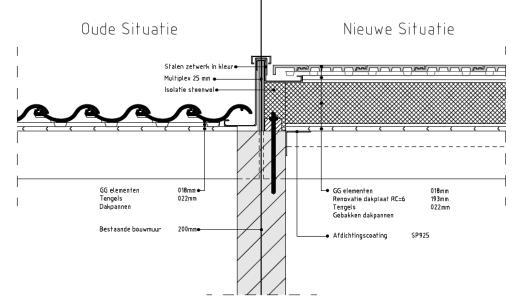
Roof renovation (source: Jansen Huybregts Projecten BV)
